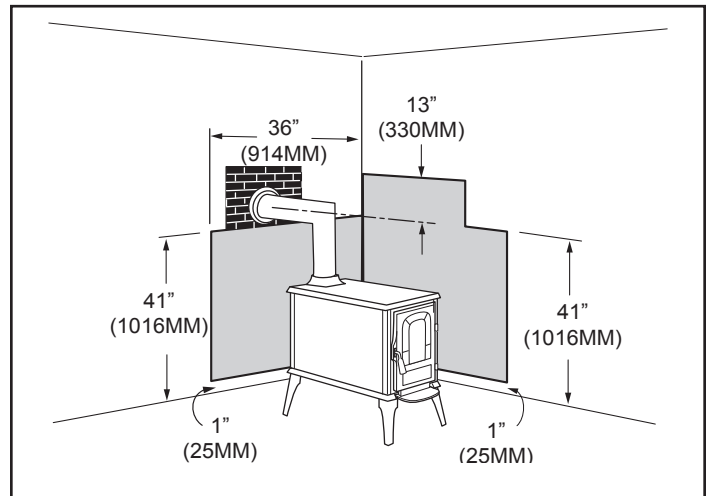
Parallel installation with rear wall pass-through, two wall shields.
